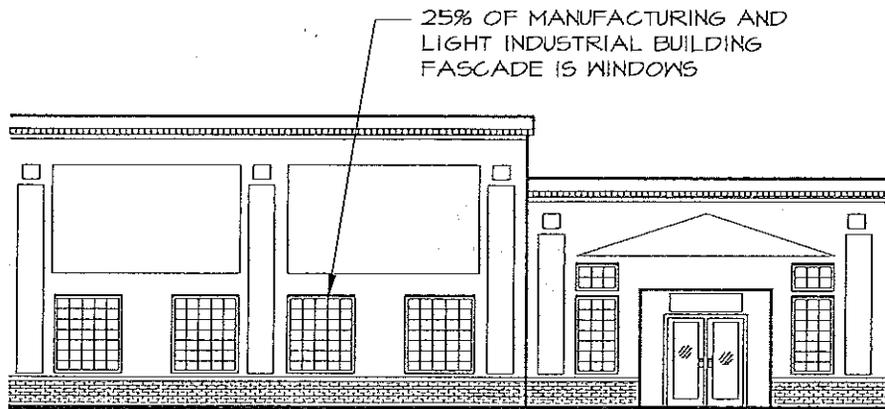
TYPICAL WINDOW COVERAGE MANUFACTURING/LIGHT INDUSTRIAL LAND USE AREA
